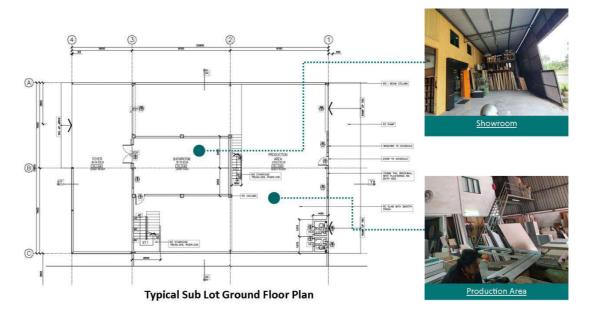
Typical Sub Lot Industrial Building Ground Floor Plan
